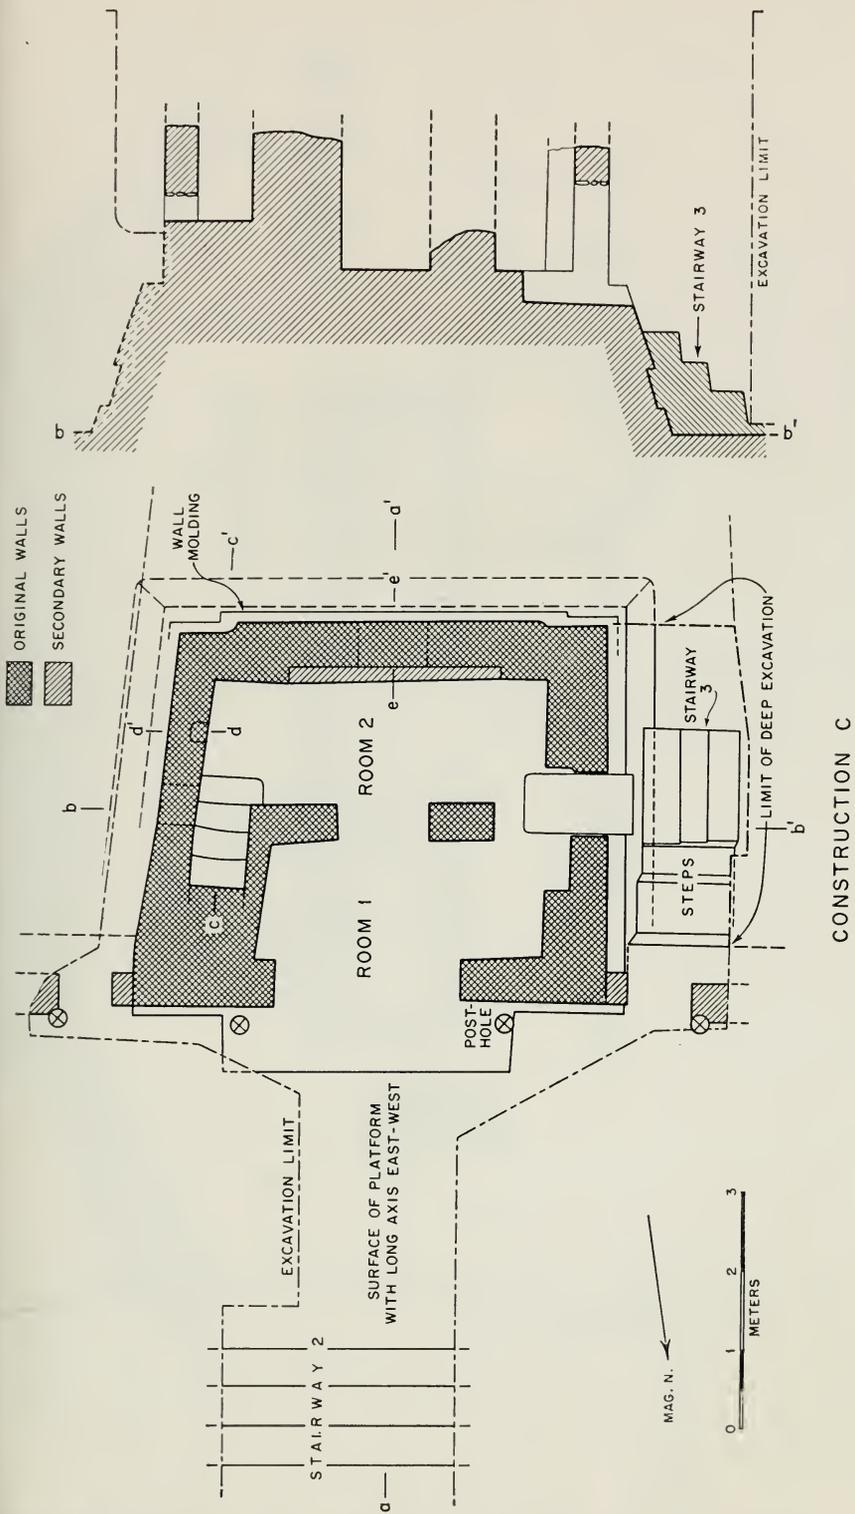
Structure I, Plan and East-West Cross-section (Section b-b') of Construction C. For Section a-a', see Fig. 3; for Sections c-c', d-d', e-e' see Fig. 5.
